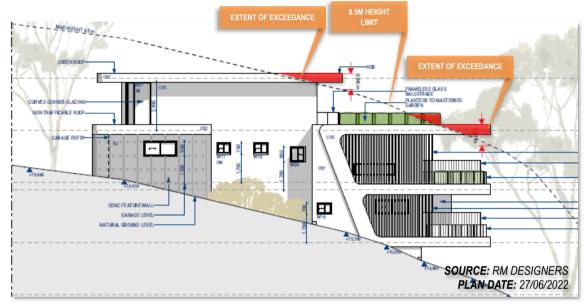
EXTRACT AND MARK-UP FROM NORTH ELEVATION INDICATING HEIGHT LIMIT BREACH
